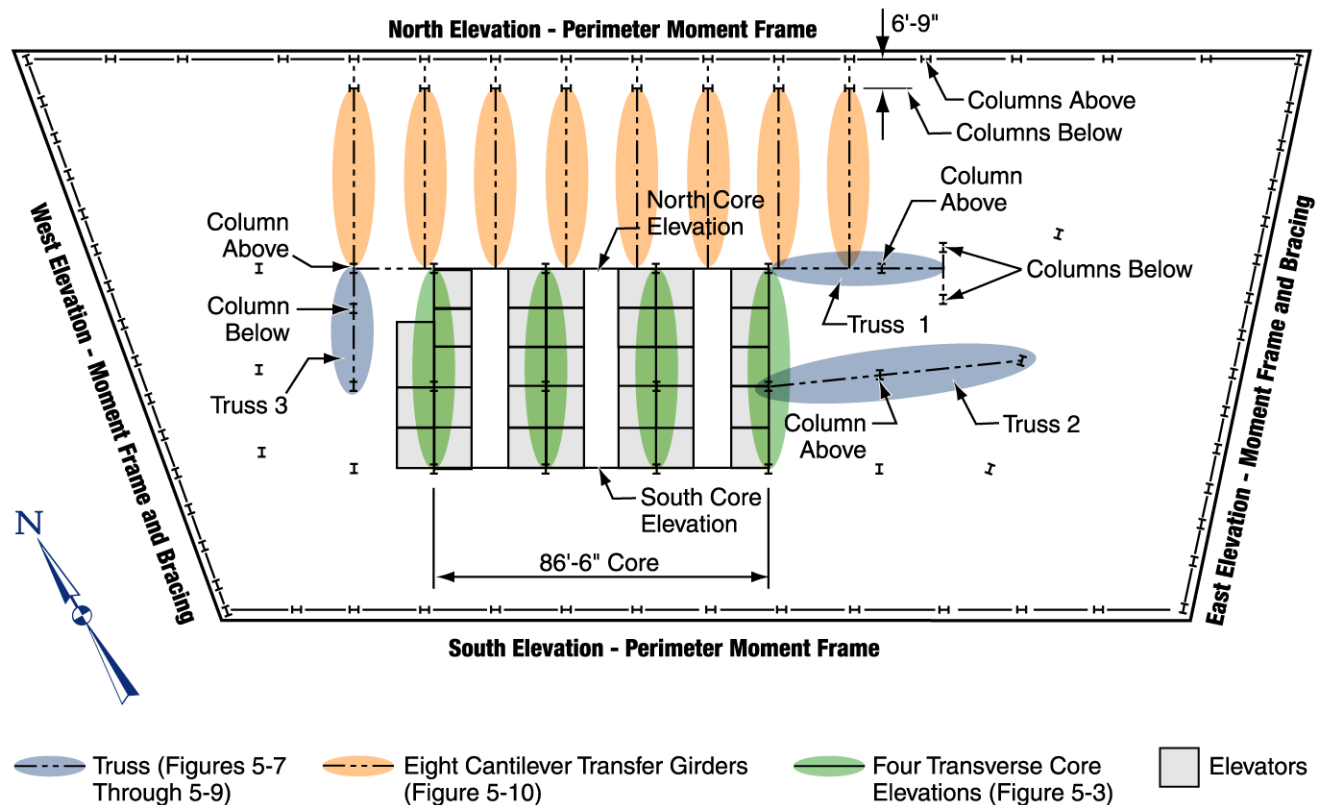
Seventh floor plan showing locations of transfer trusses and girders.
